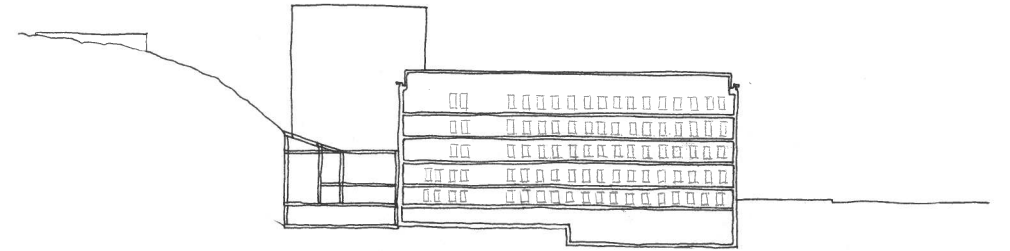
section BB' 1:1000, proposal pre p2 crit
